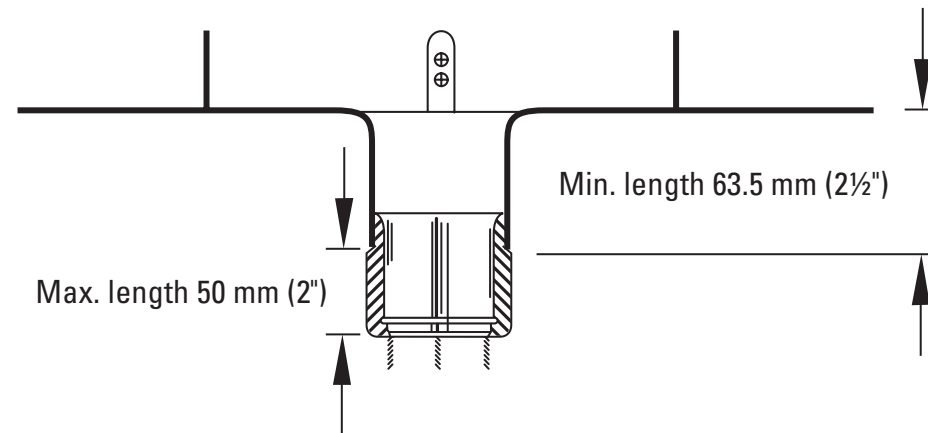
The minimum length of the metal retrofit drain stem with a U-Flow Seal Assembly.
